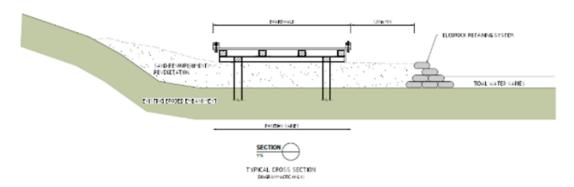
Stage 4 Proposed Works- Elevate Consulting Engineers
